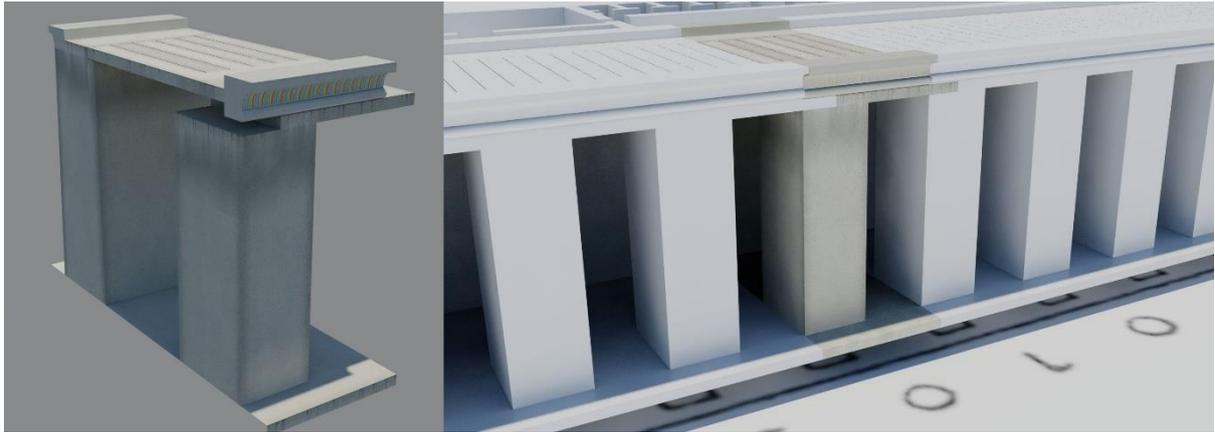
, an assembly of instanced objects (left) used to construct a larger colonnade (right)
